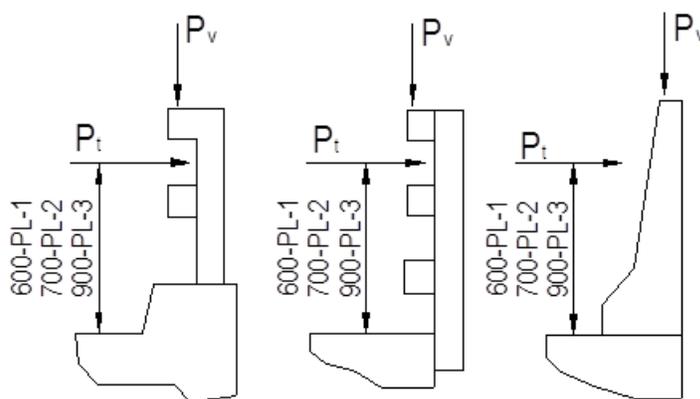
Application of design loads to traffic barriers (CAN/CSA-S6-06)
